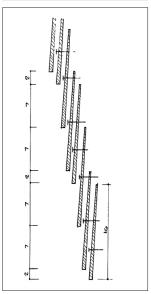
To vary the exterior cladding for this house, we coursed the shingles in a 7"-7"-2" pattern. Note in the bottom detail that the nails always go through two layers.
